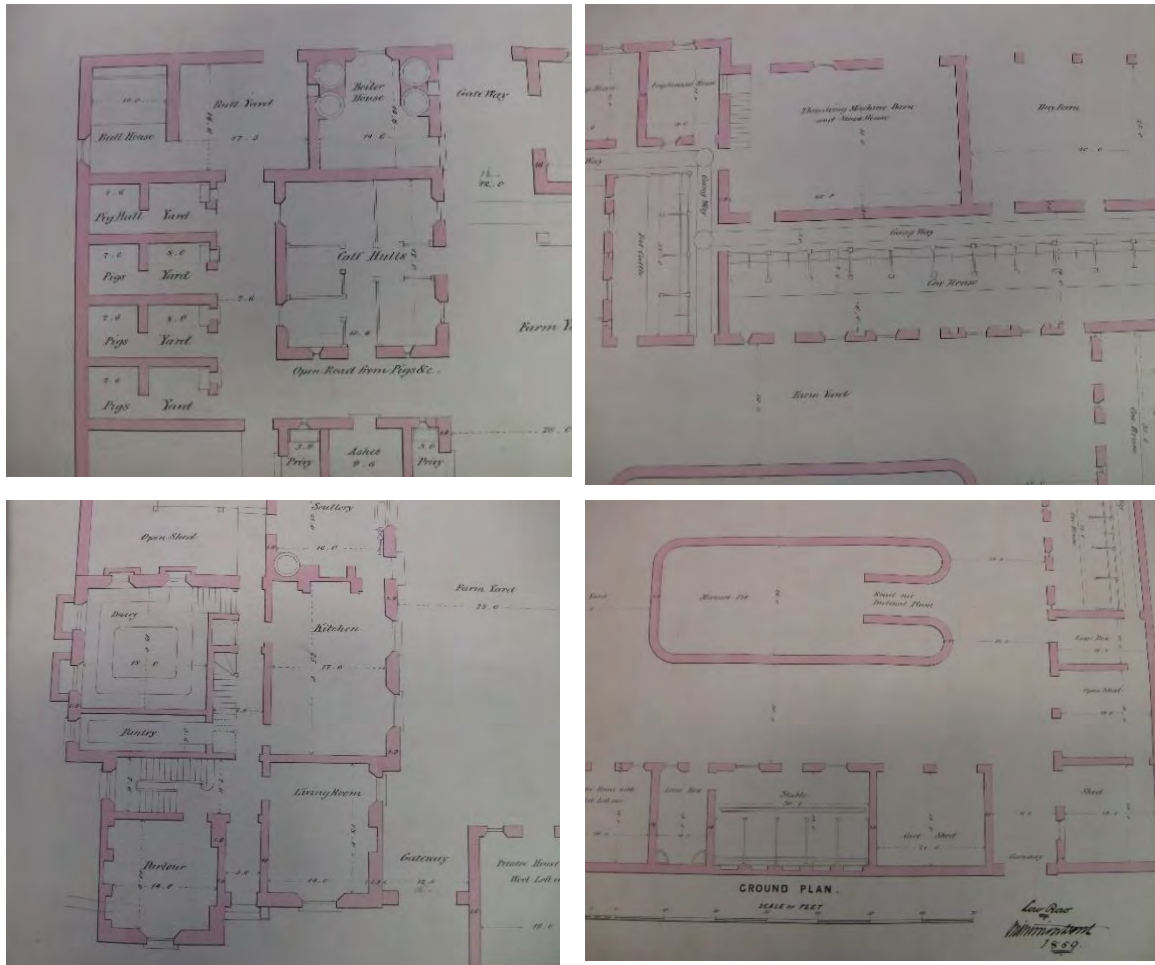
Ground floor plan of Low Row, 1859, which have been signed by Wilkinson Dent (bottom right corner).¹¹¹
